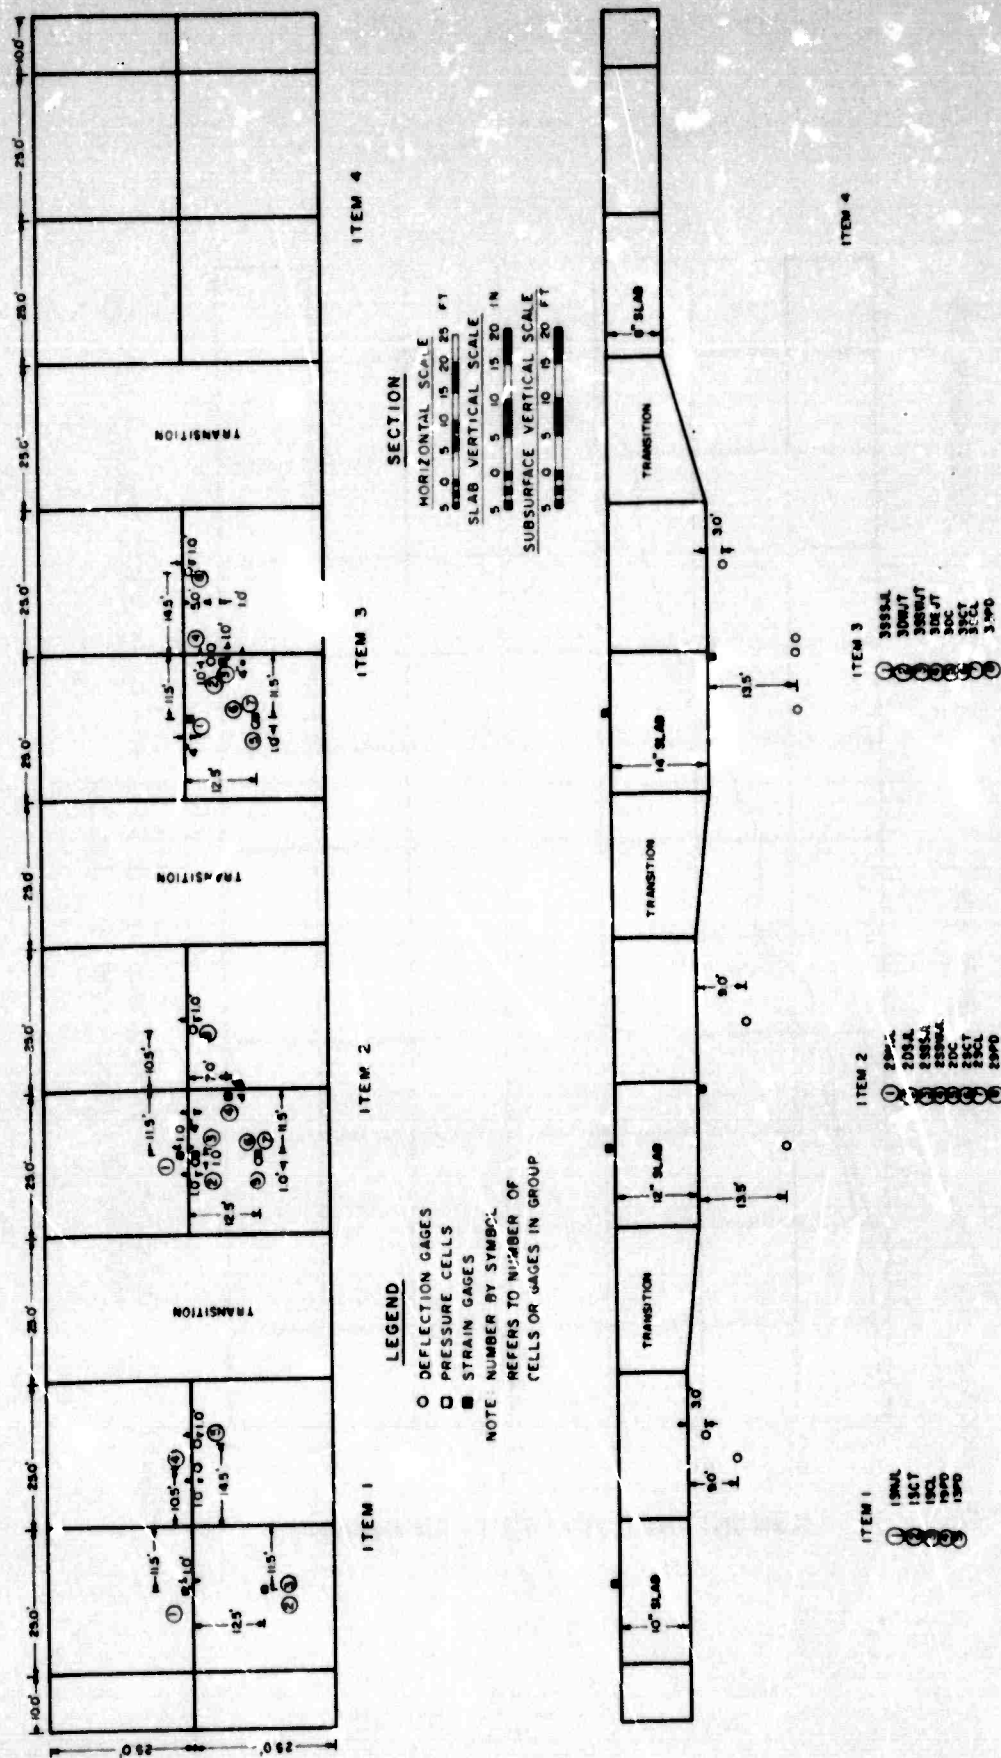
Instrumentation Layout at Start of 12-Wheel Traffic, Rigid Pavement Test Section
